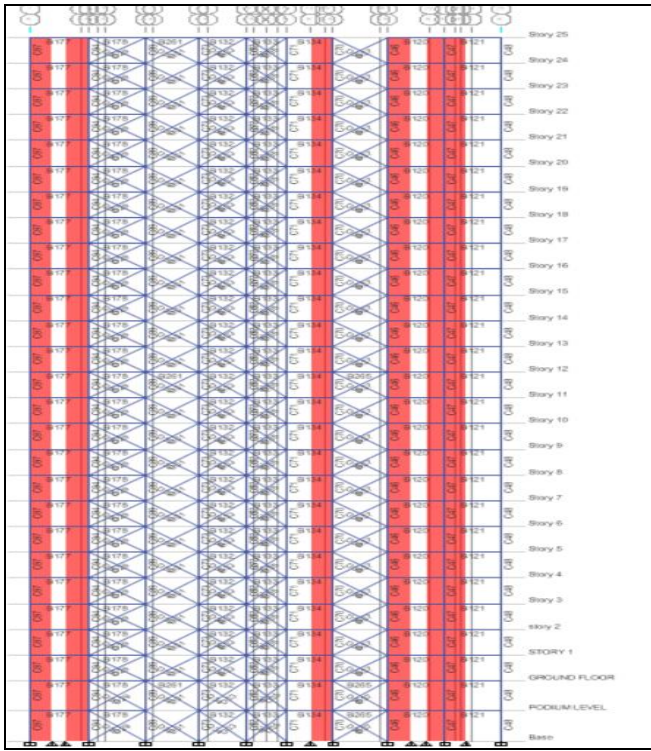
Elevation of Shear wall with Bracings Model (Case1)
